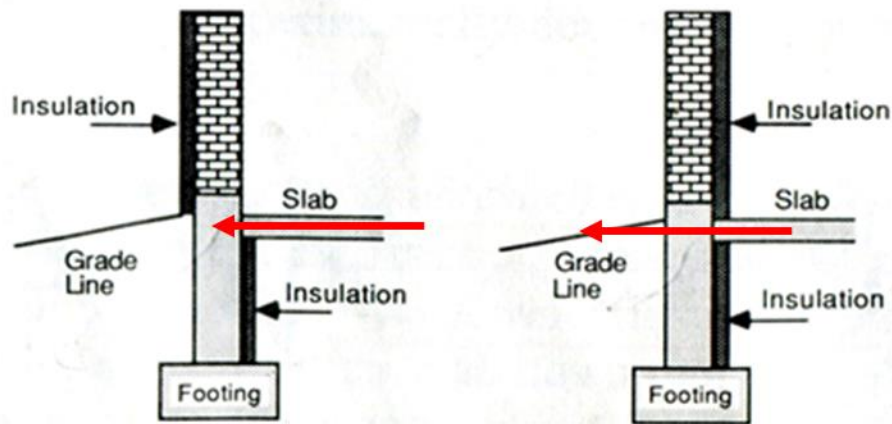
Examples of insulation added to slab floors and footings which form thermal bridges.
